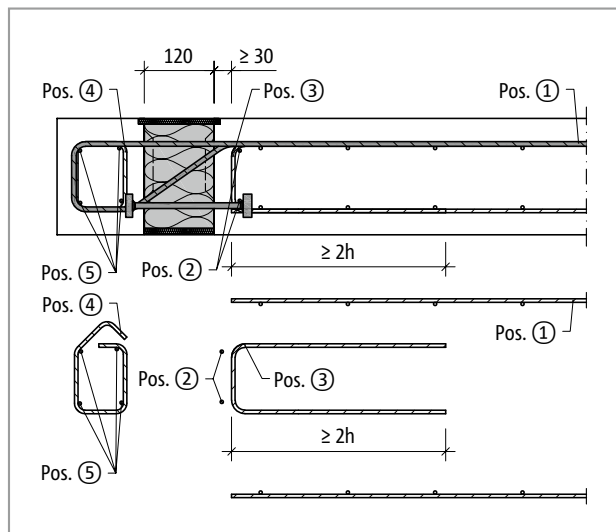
Schöck Isokorb® XT type O: On-site reinforcement
